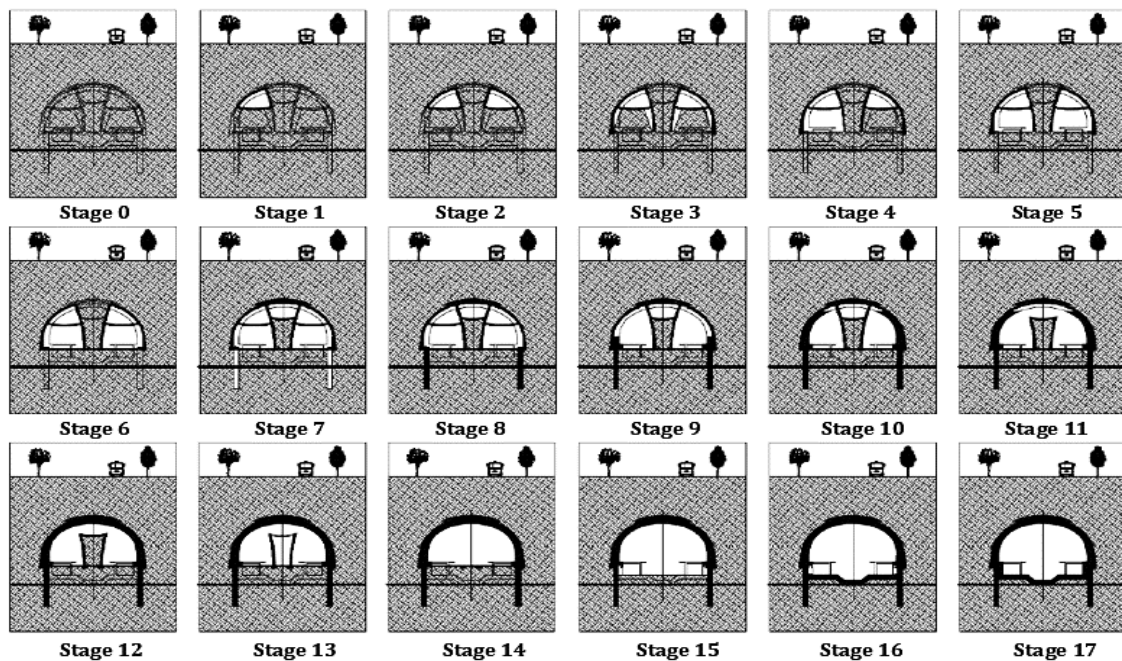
Step-by-step construction stages of the stations' central core using NATM-STM and braced piling methods.
